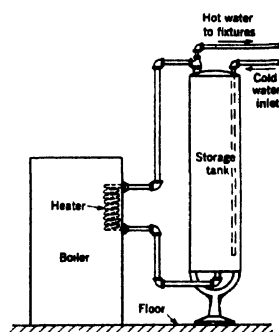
INDIRECT WATER HEATER PLACED IN BOILER
